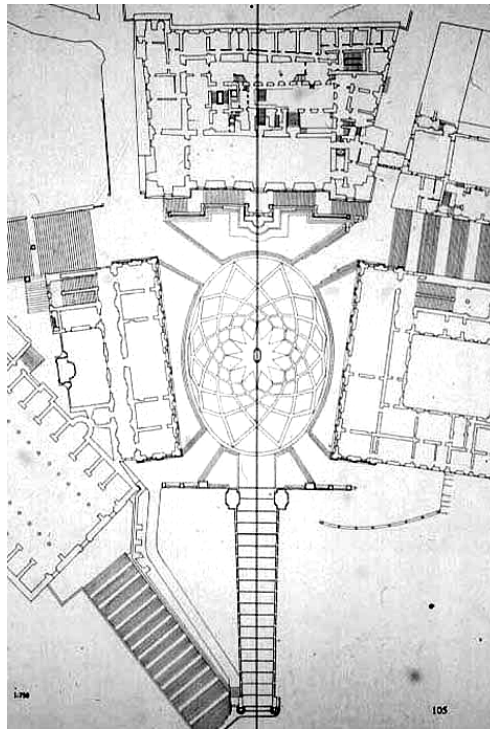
Piazza del Campidoglio, plan of buildings.
